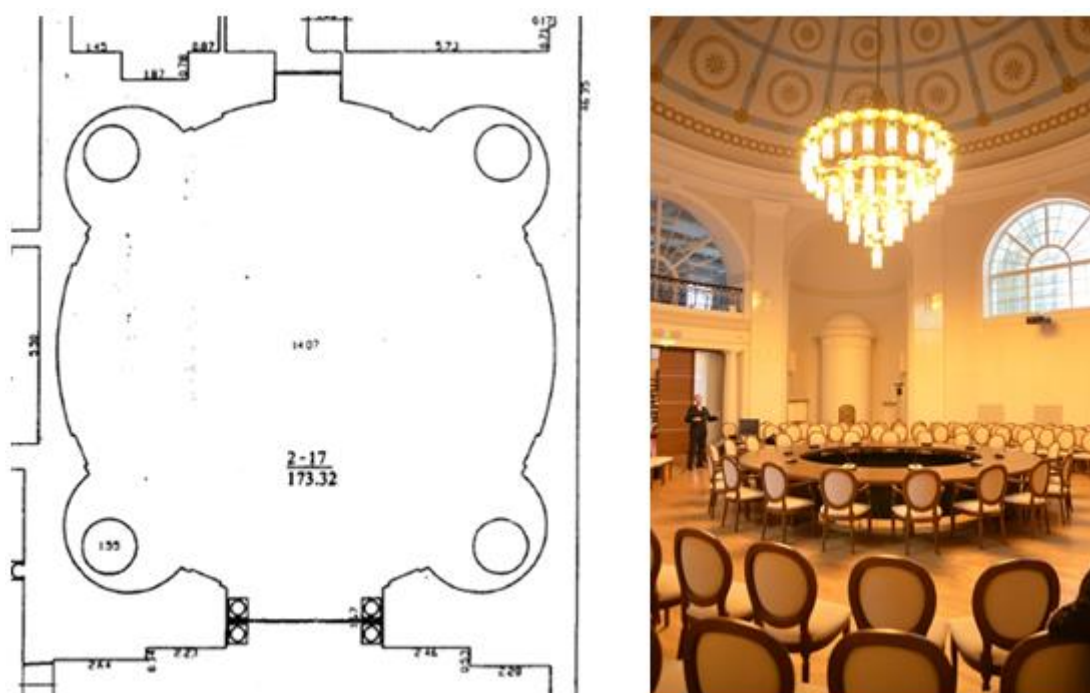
Floor plan (left) and the general view of the hall interior (right).
